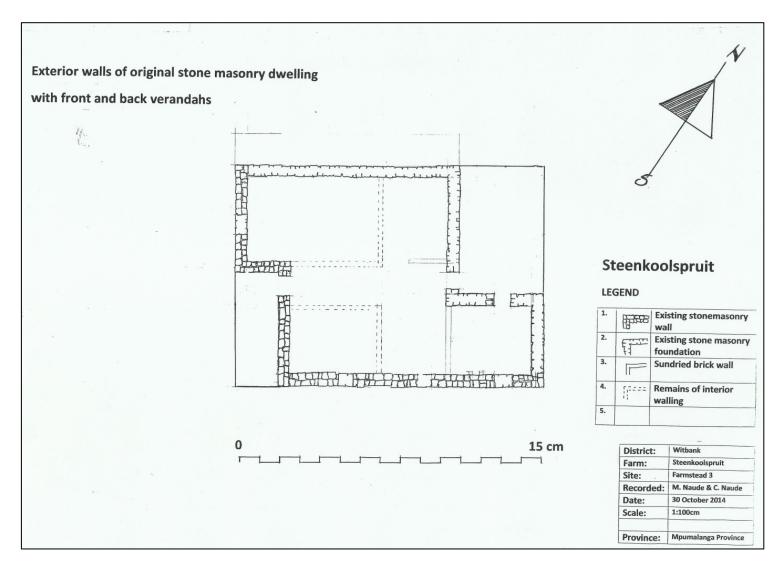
Floor plan of the original dwelling with the exterior stone masonry walls and the hypothetical interior division of spaces as most of the sundried brick walls have disappeared - scale15cm equals 15m (Drawing: M. Naude 2014).
